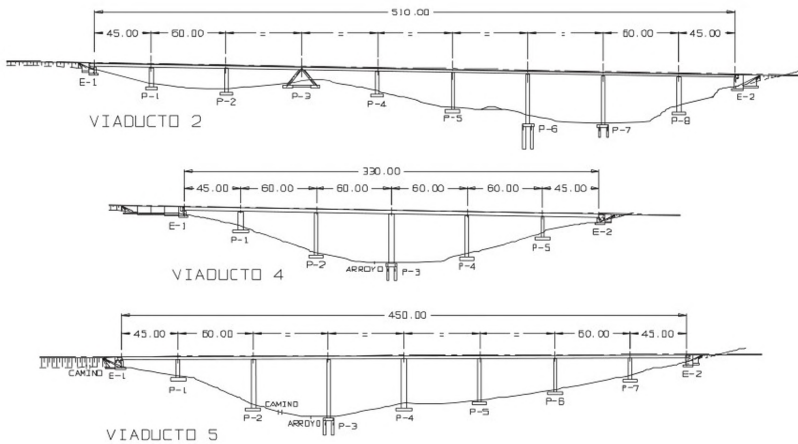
Viaduct 2.4.5. Madrid-Zaragoza. High speed line. Sub stretch VIII (Spain).
